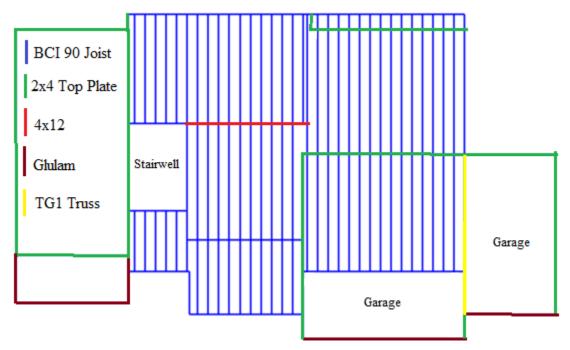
Second floor framing plan showing I joists, as well as top plates and supporting beams.
